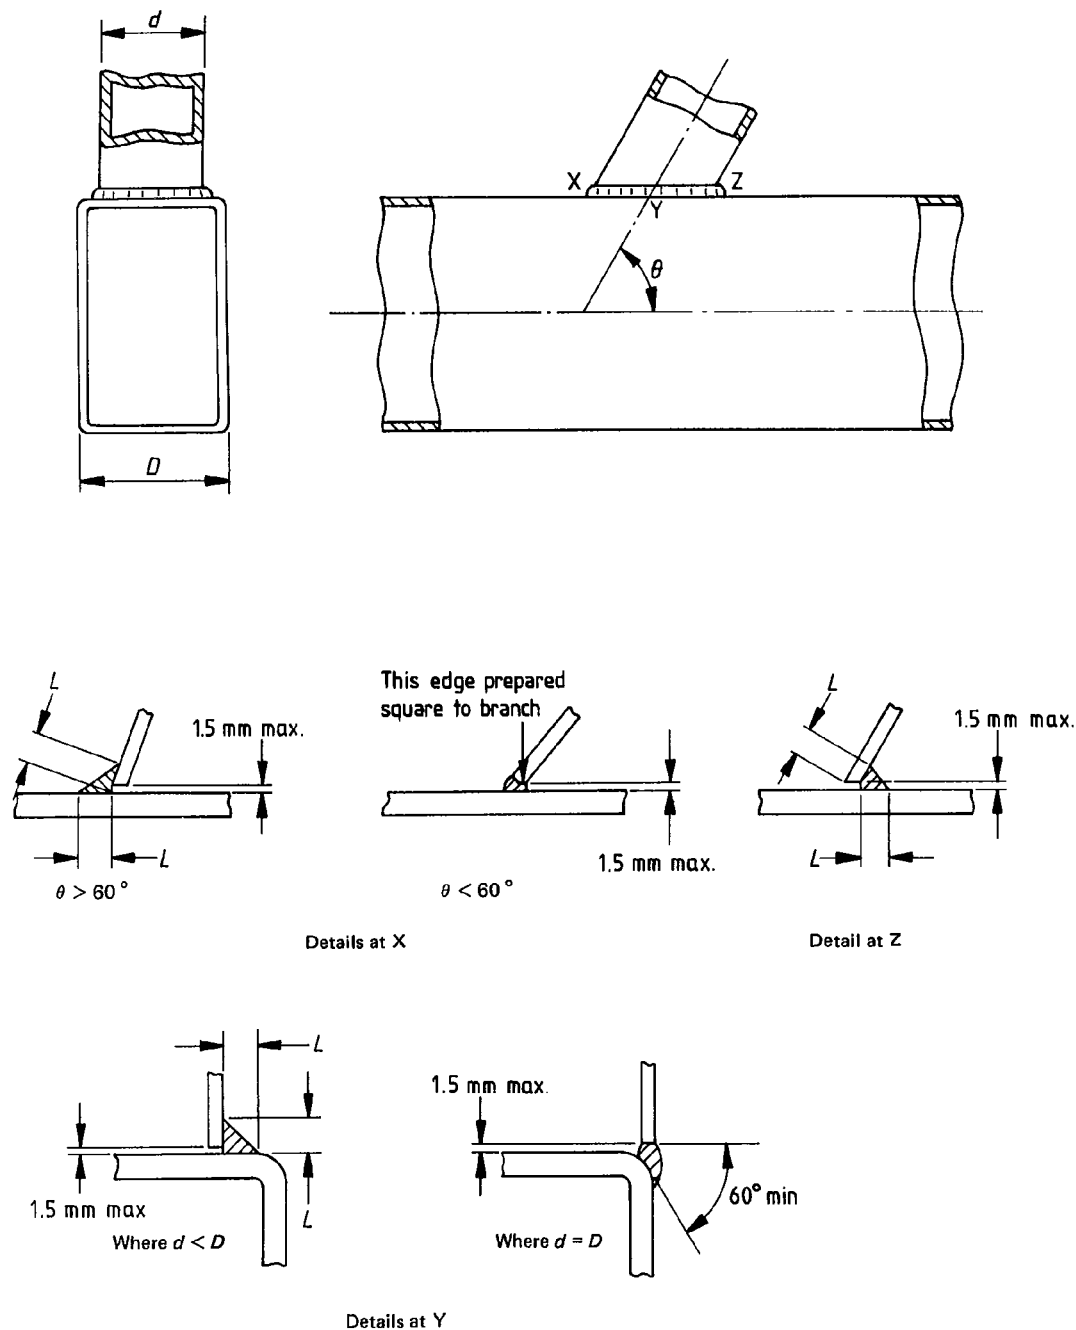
Typical details for branch connections for rectangular structural hollow sections: butt welds
